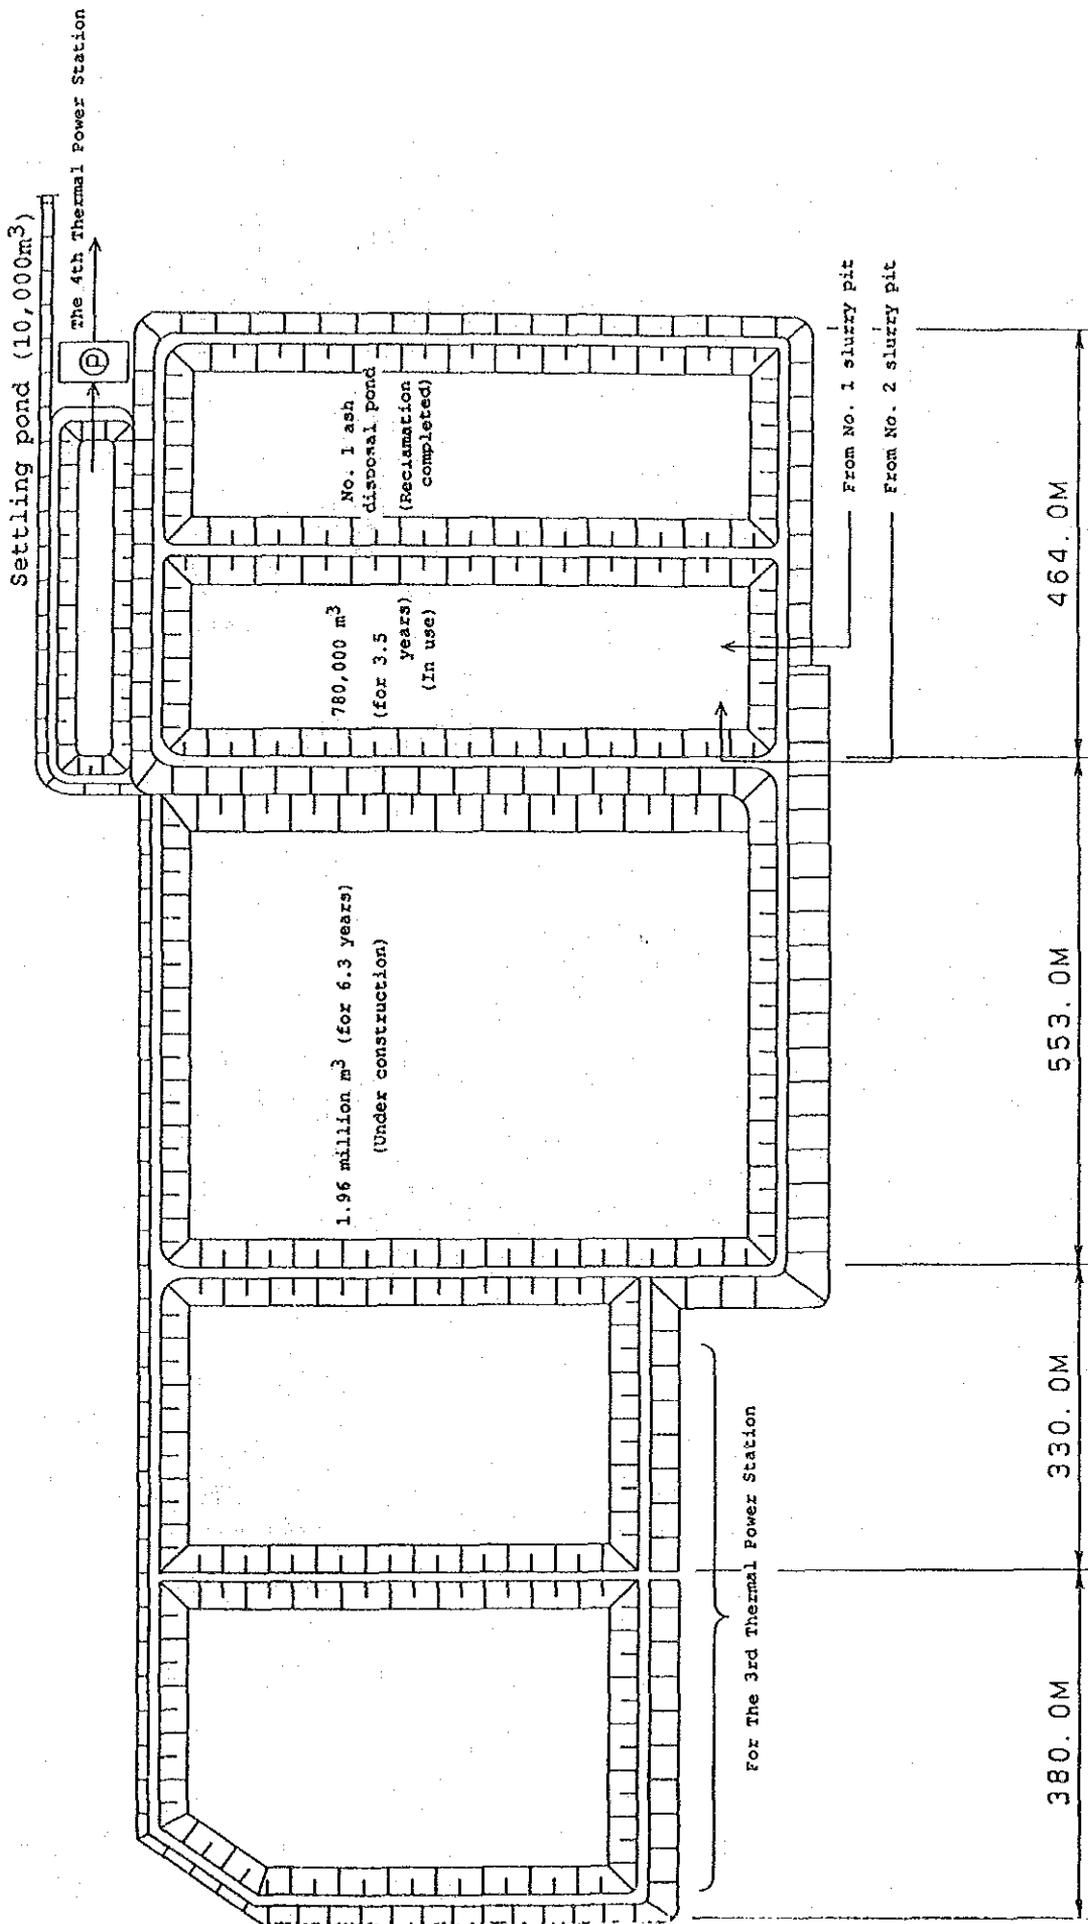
(8) Layout of Ash Disposal Ponds
